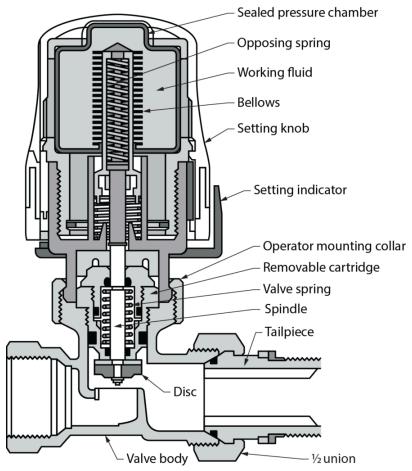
Thermostatic radiator valve (cutaway). (Skilled Trades BC, 2021) Used with permission.
